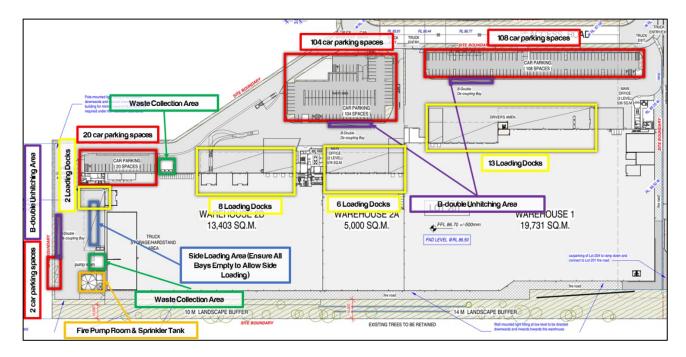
Light and Heavy Vehicle Parking and Loading Areas
